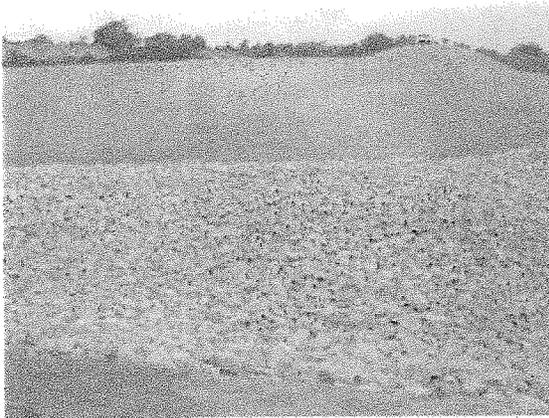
Flood Retarding Structure: Earthfill, shaping and rock armor at outlet of auxiliary spillway.
